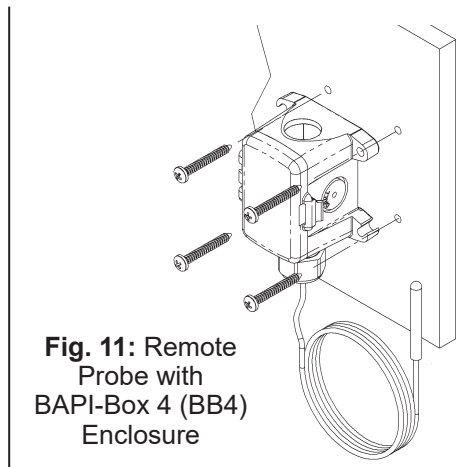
Remote Probe with BAPI-Box 4 (BB4) Enclosure
